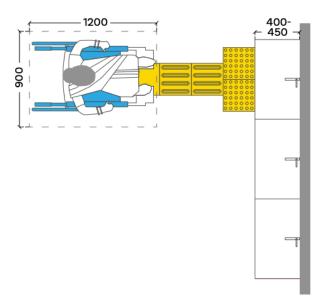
Typical layout for accessible drinking water fountain (in mm)
